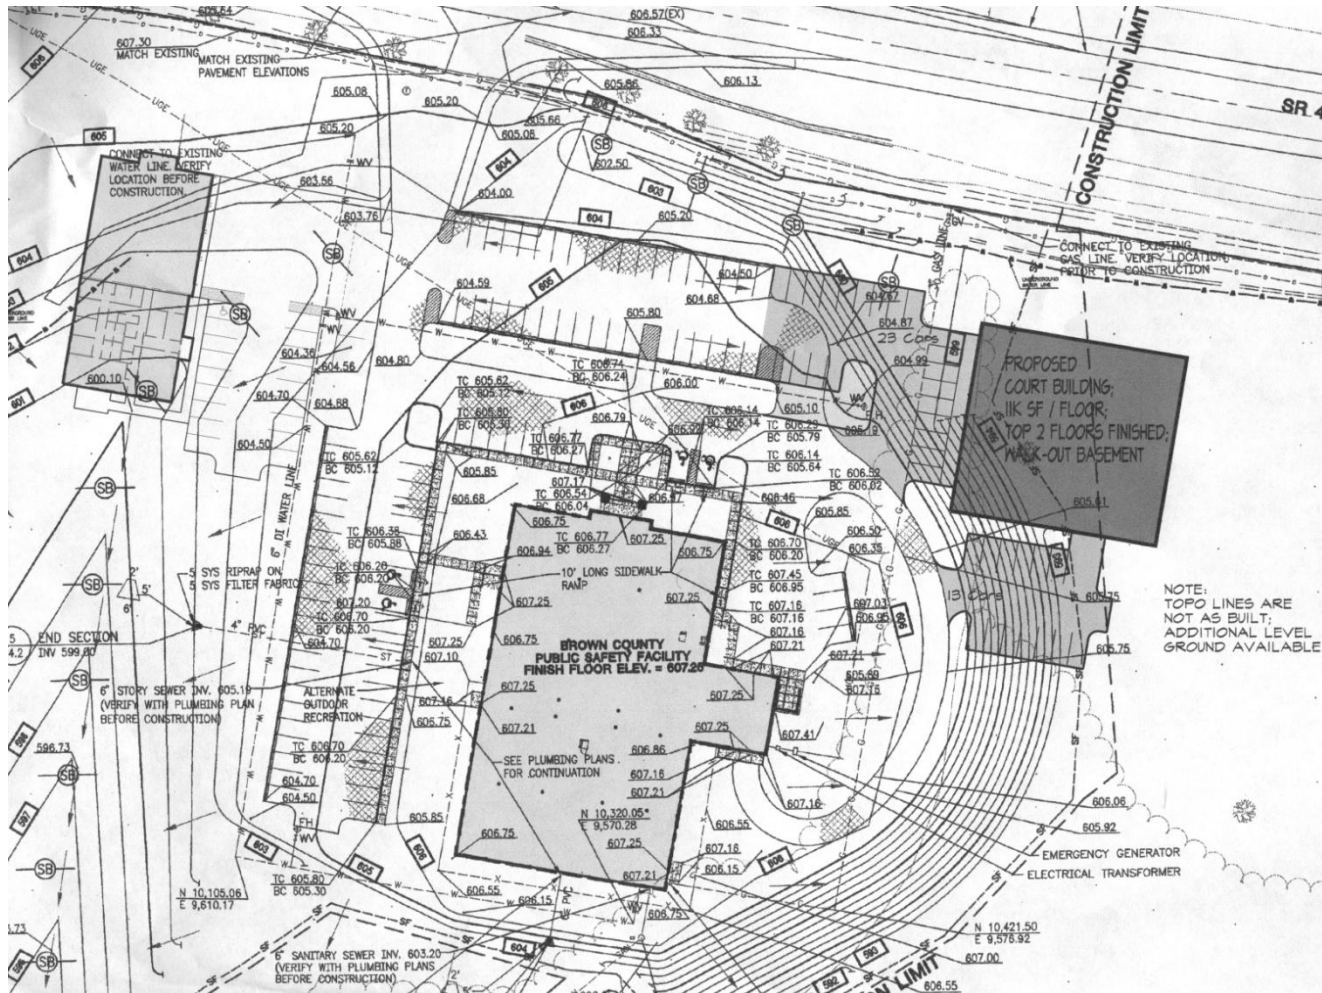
Proposed site plan and footprint for New Court Building, Option 2, at Law Enforcement Center property.
